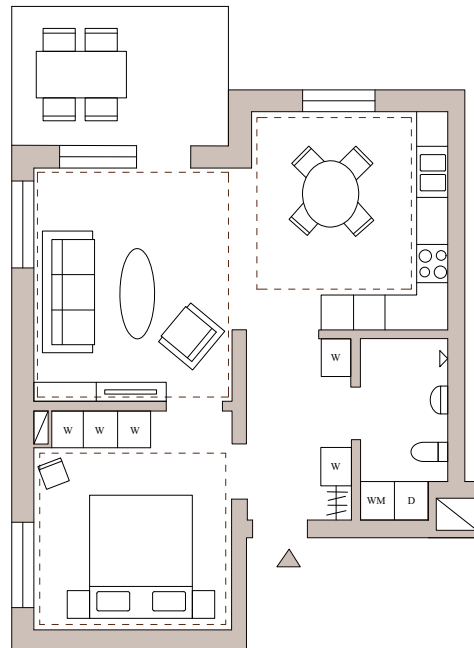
Multifunctional zones in floor plan. Redrawn from MAB [55]
